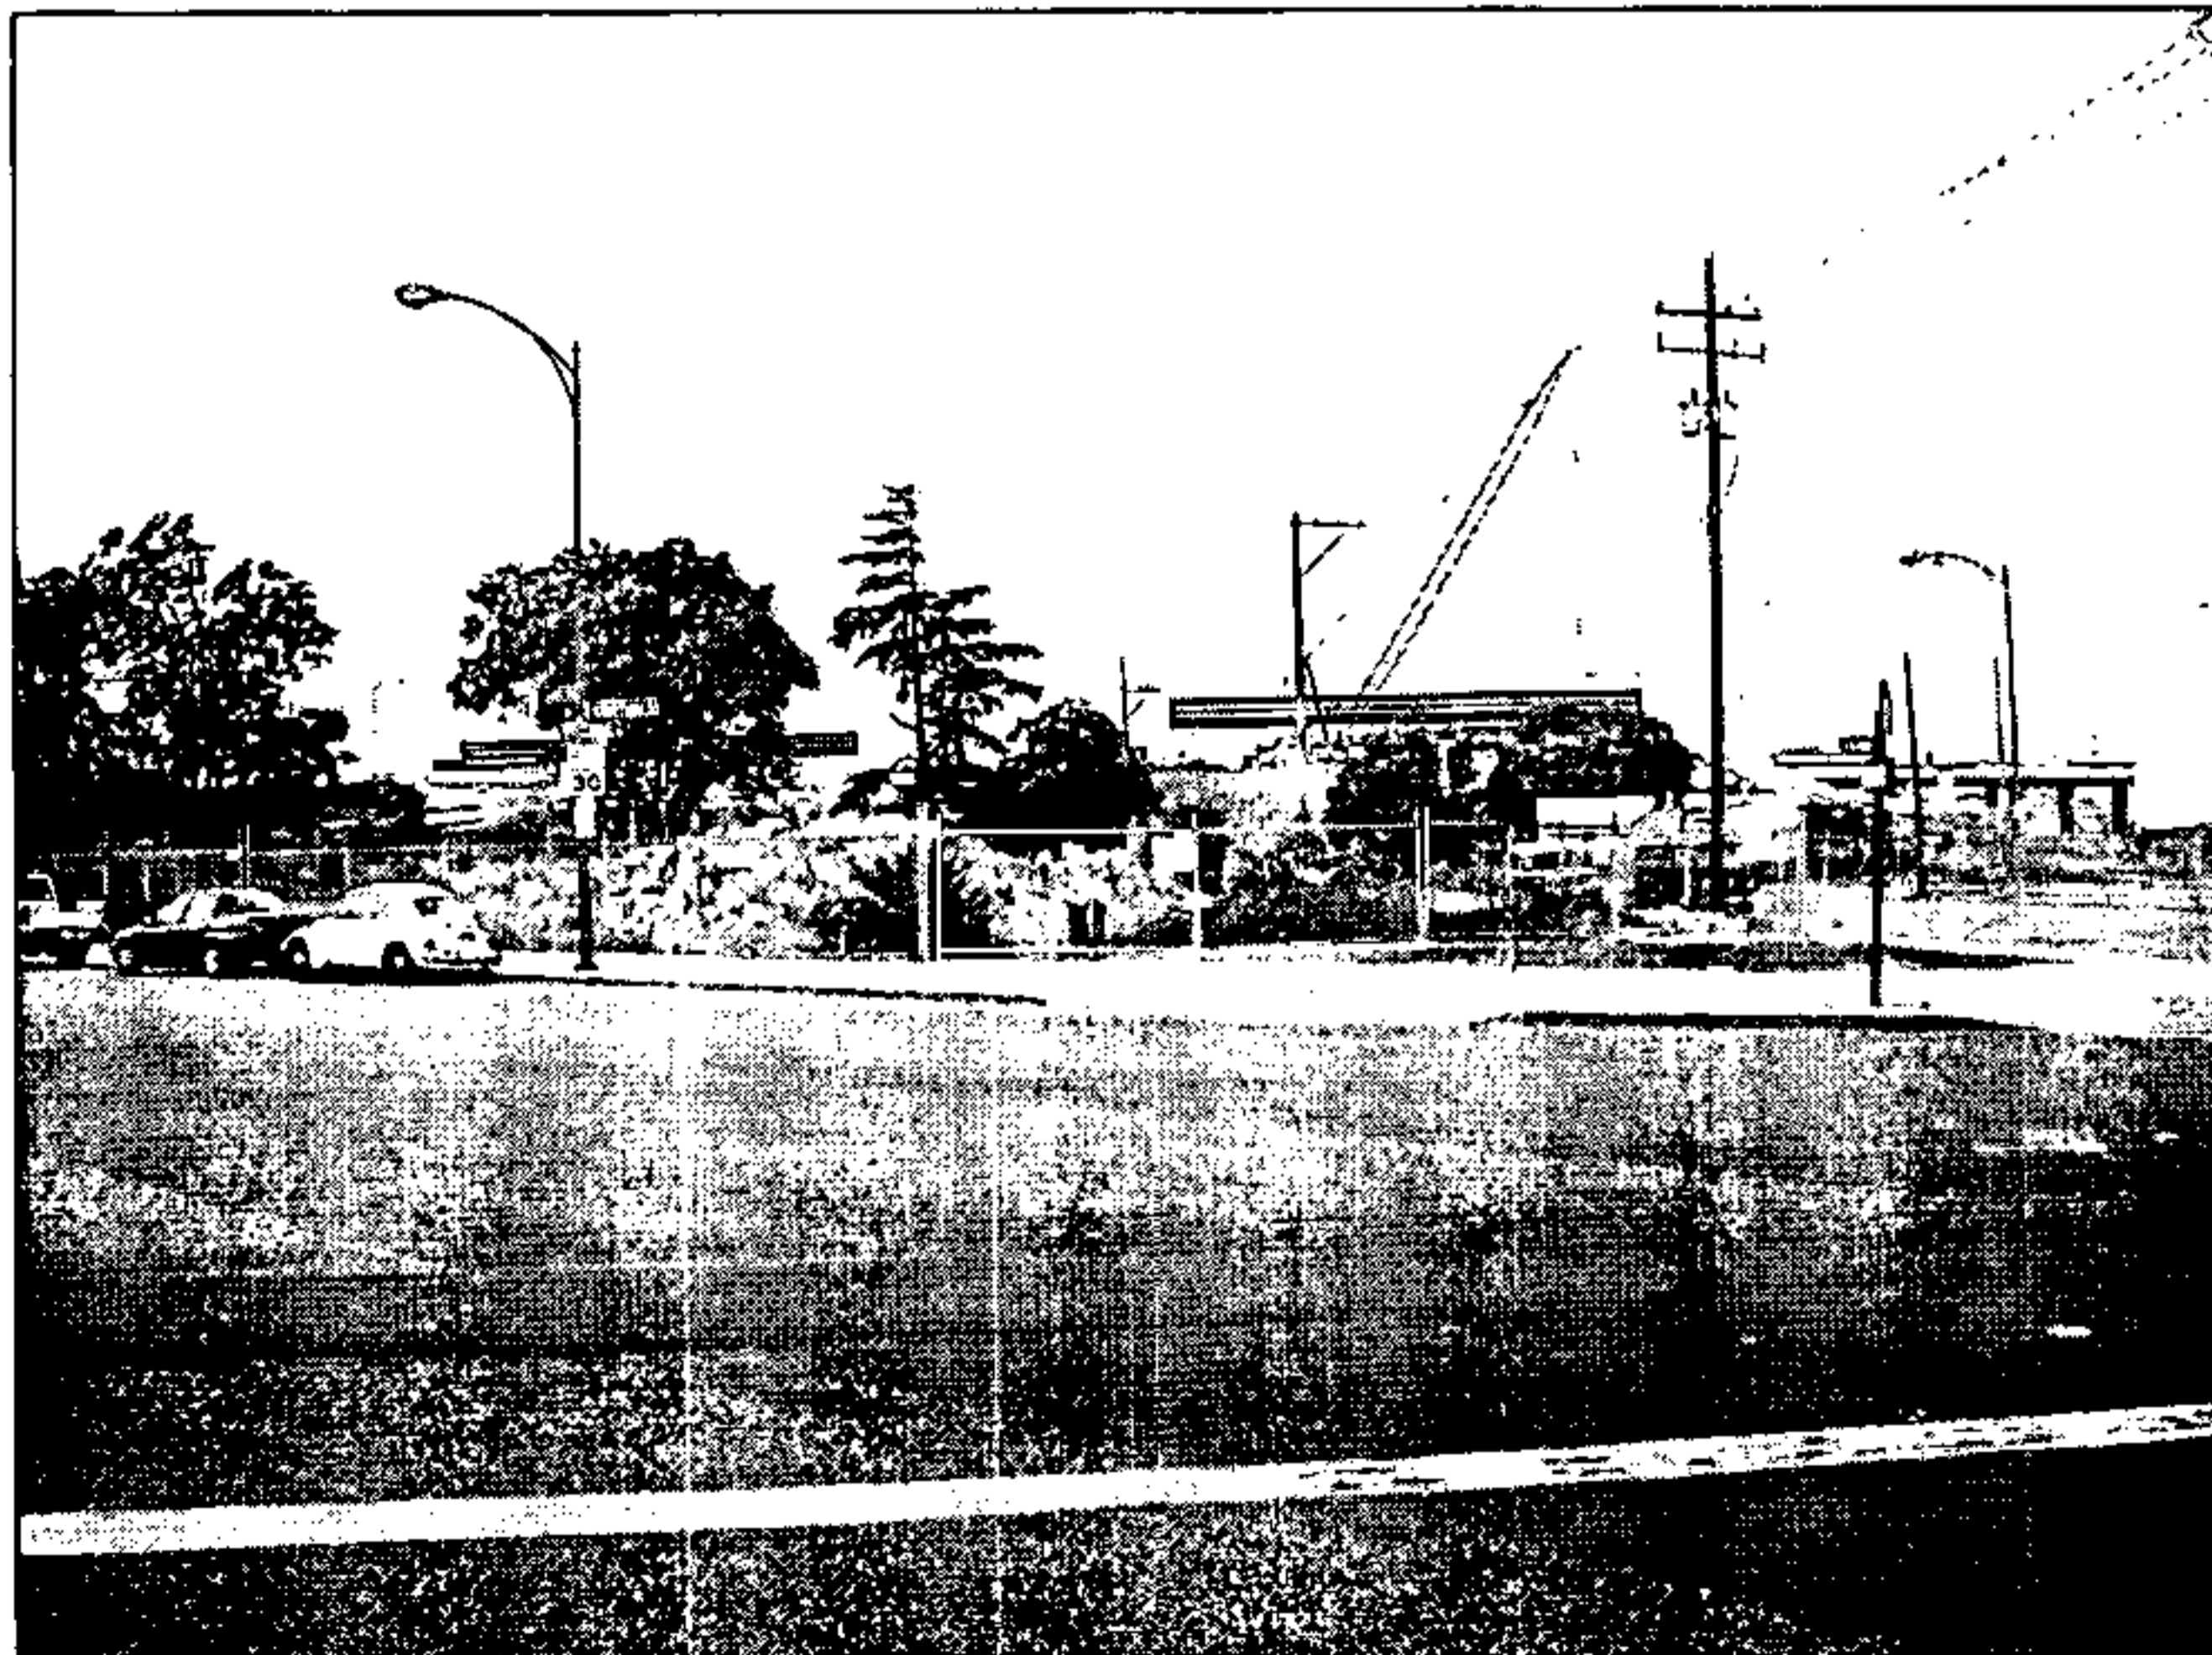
View of Distant Office Buildings, Looking Southwest
